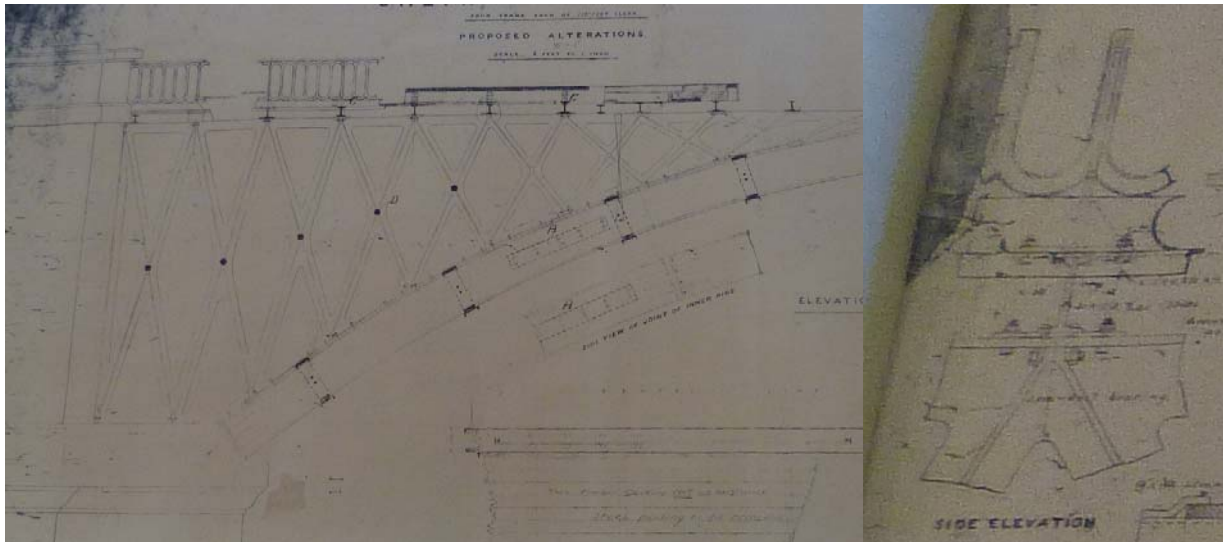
Bridge parapet detail (courtesy Cork City and County Archives)
